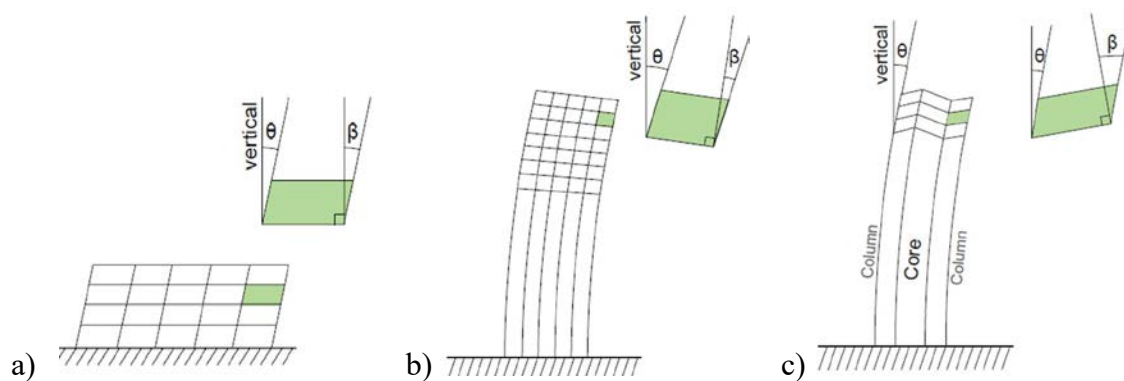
a/ Low-rise building – interstorey drift same as panel deformation b/ Tubular building – interstorey drift higher than panel deformation c/ Core building – interstorey drift can be lower than panel deformation
